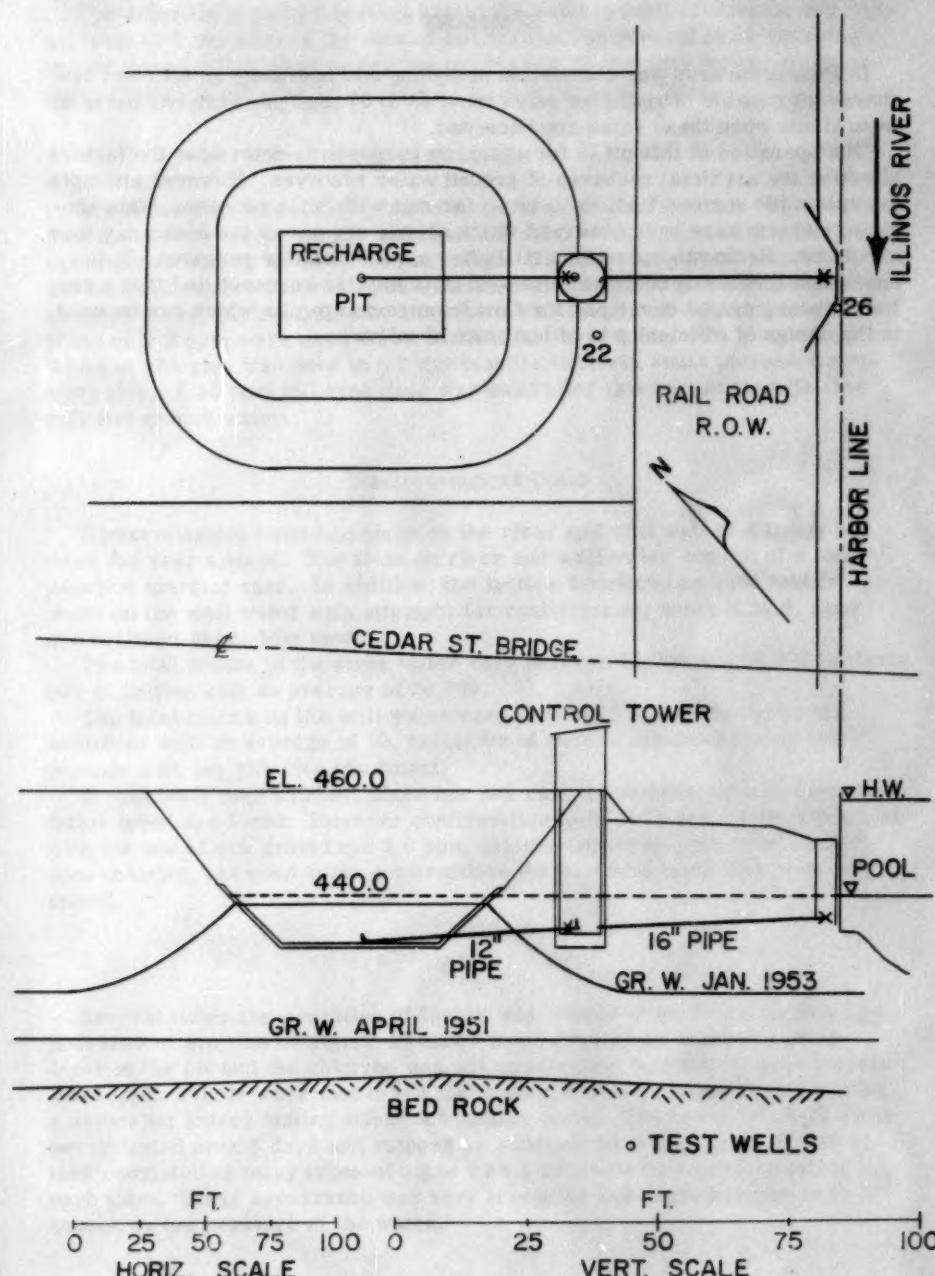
Plan of Layout and Longitudinal Section of Recharge Pit.
